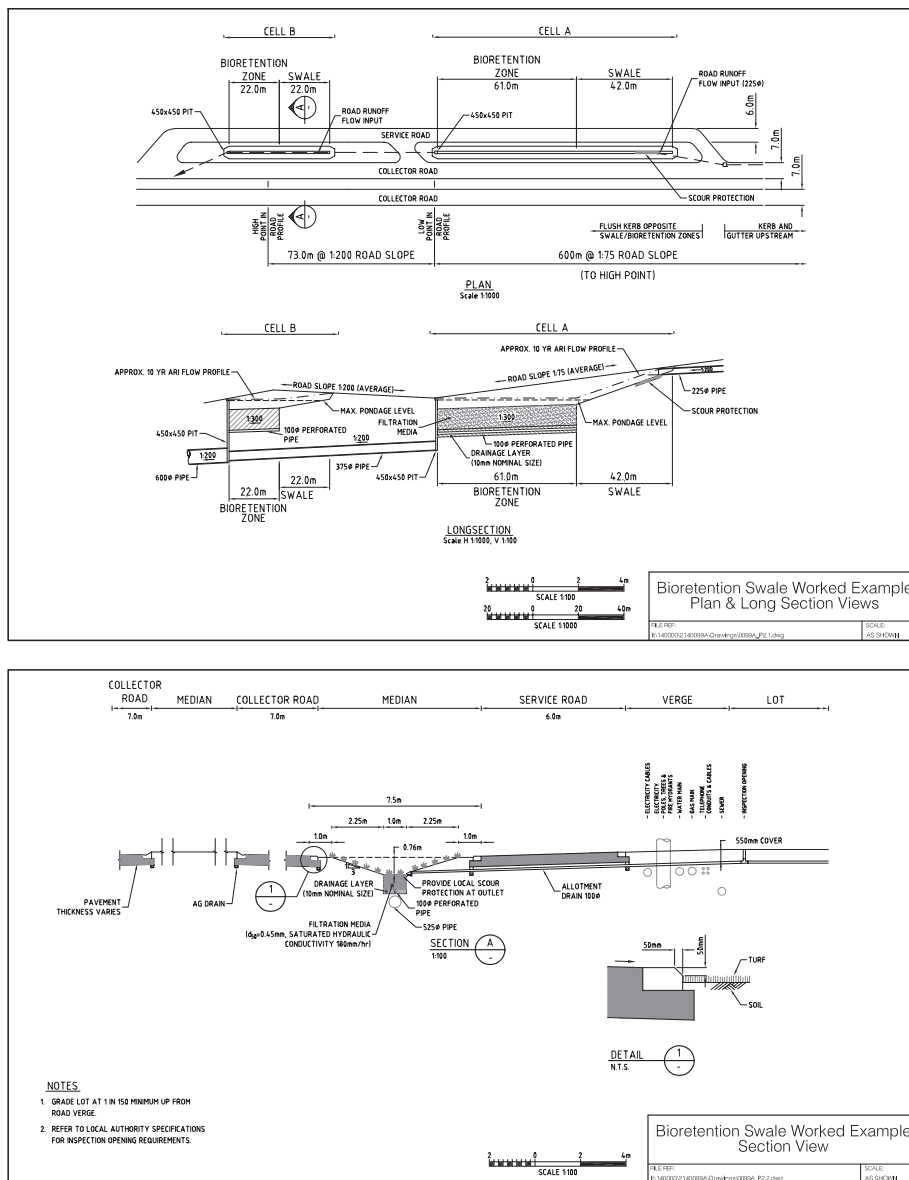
Construction drawing of the bioretention swale worked example, and a section view.
